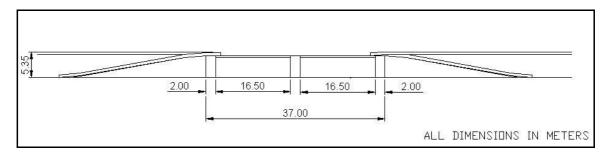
Side View Crossing Junction Switch Dimensions
